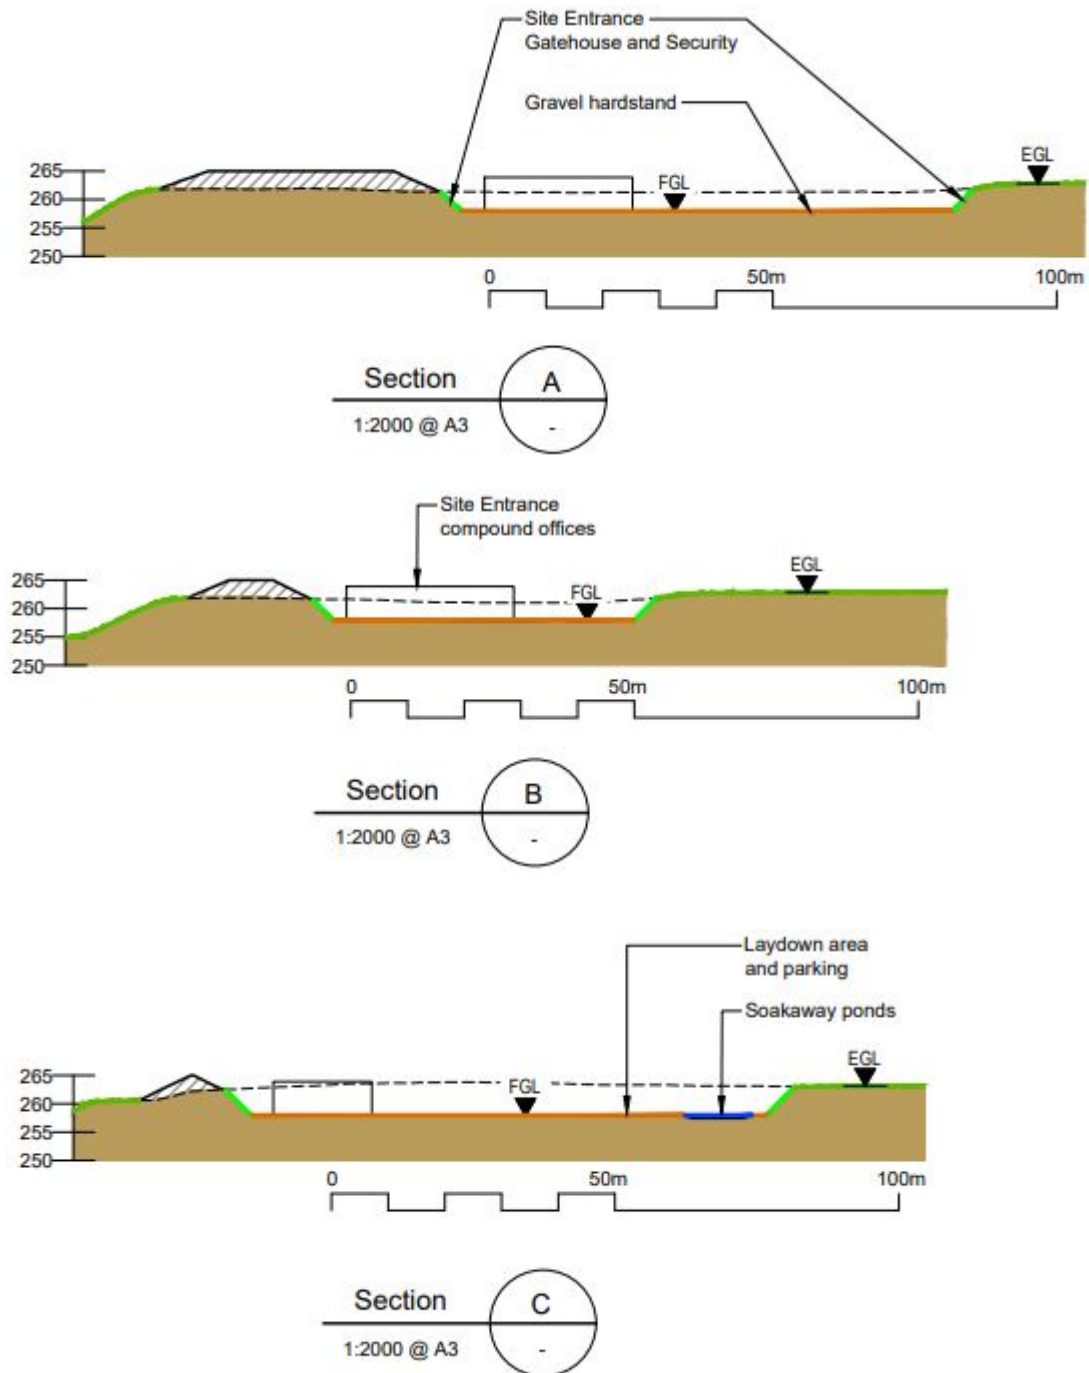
Sections through Site Compound 1 and Borrow Pit 1 at Moy
